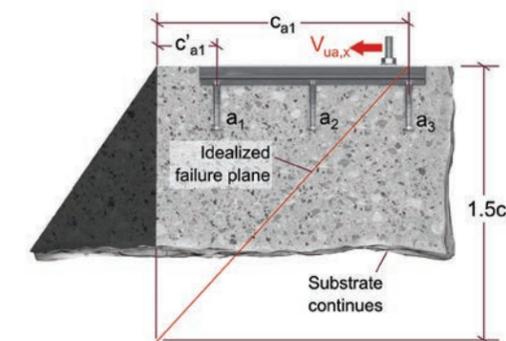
Obtuse corner — Longitudinal shear — Section view.
